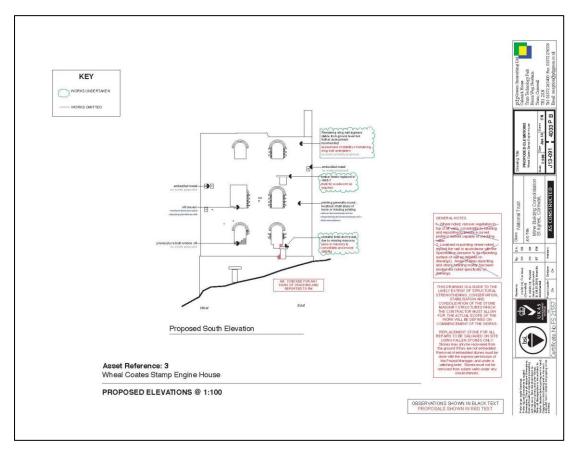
Southern external elevation of Wheal Coates stamps engine house.
